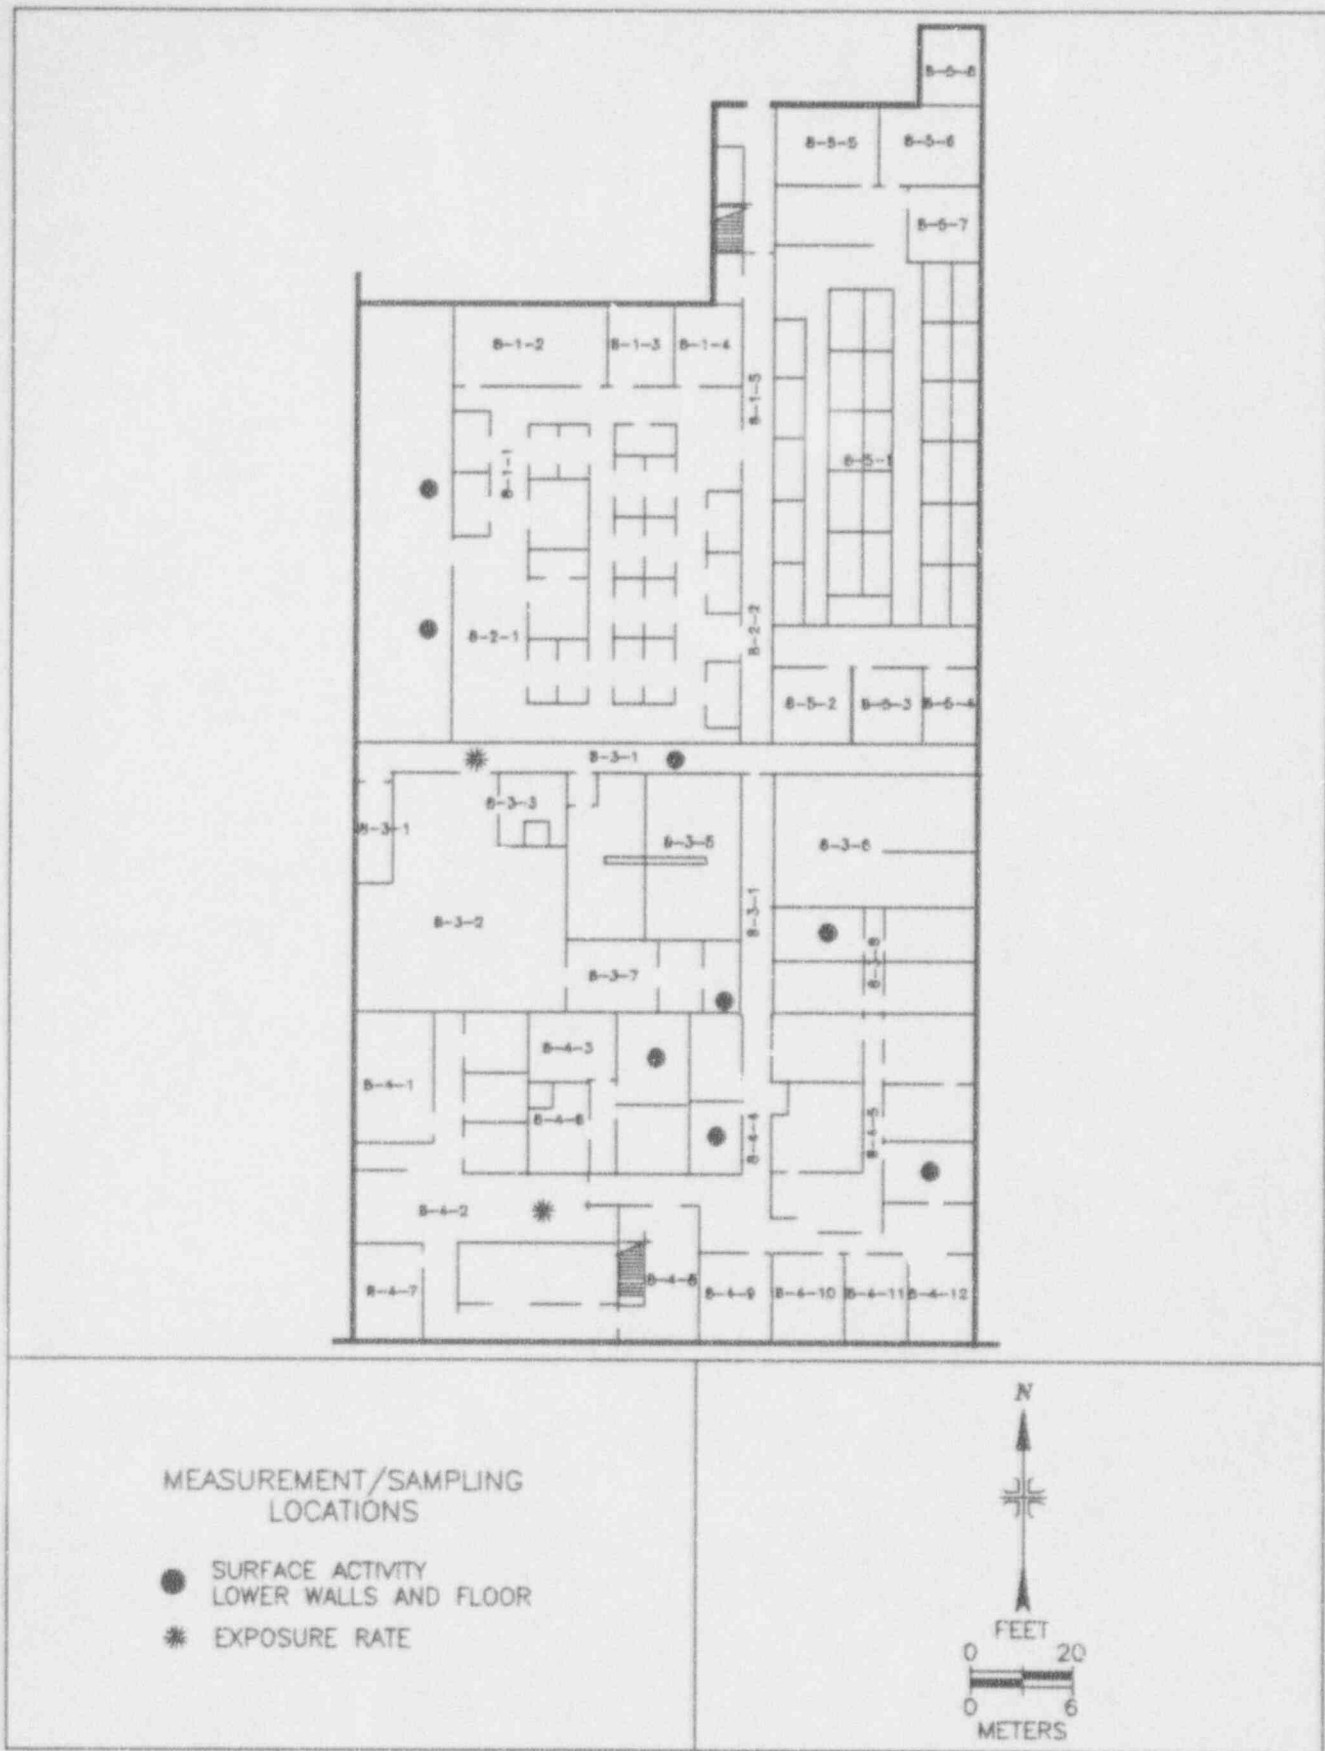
Building 8A, First Floor - Measurement and Sampling Locations
